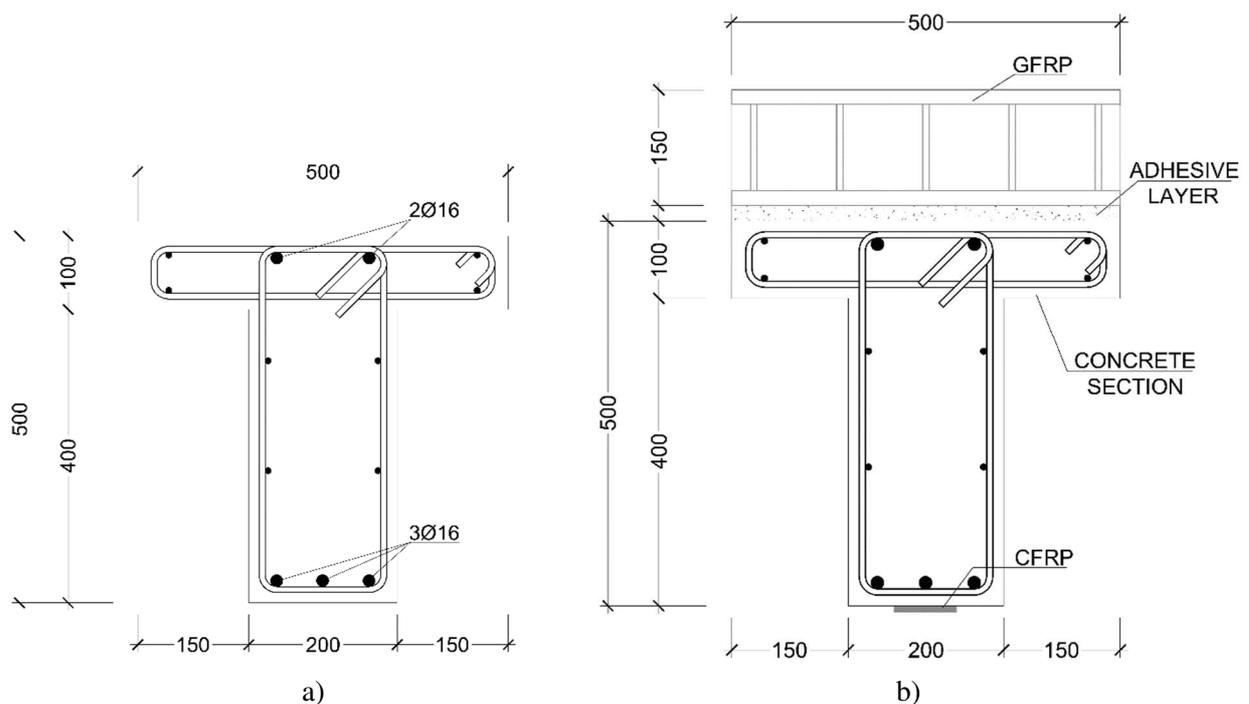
Prototype reinforced concrete beam: a) un-strengthened; b) strengthened
